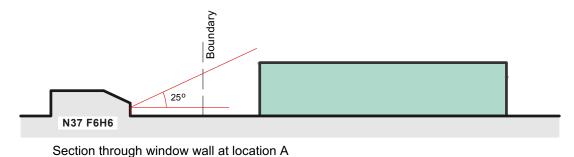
Sections perpendicular to window wall at locations indicated in Figure 3.
